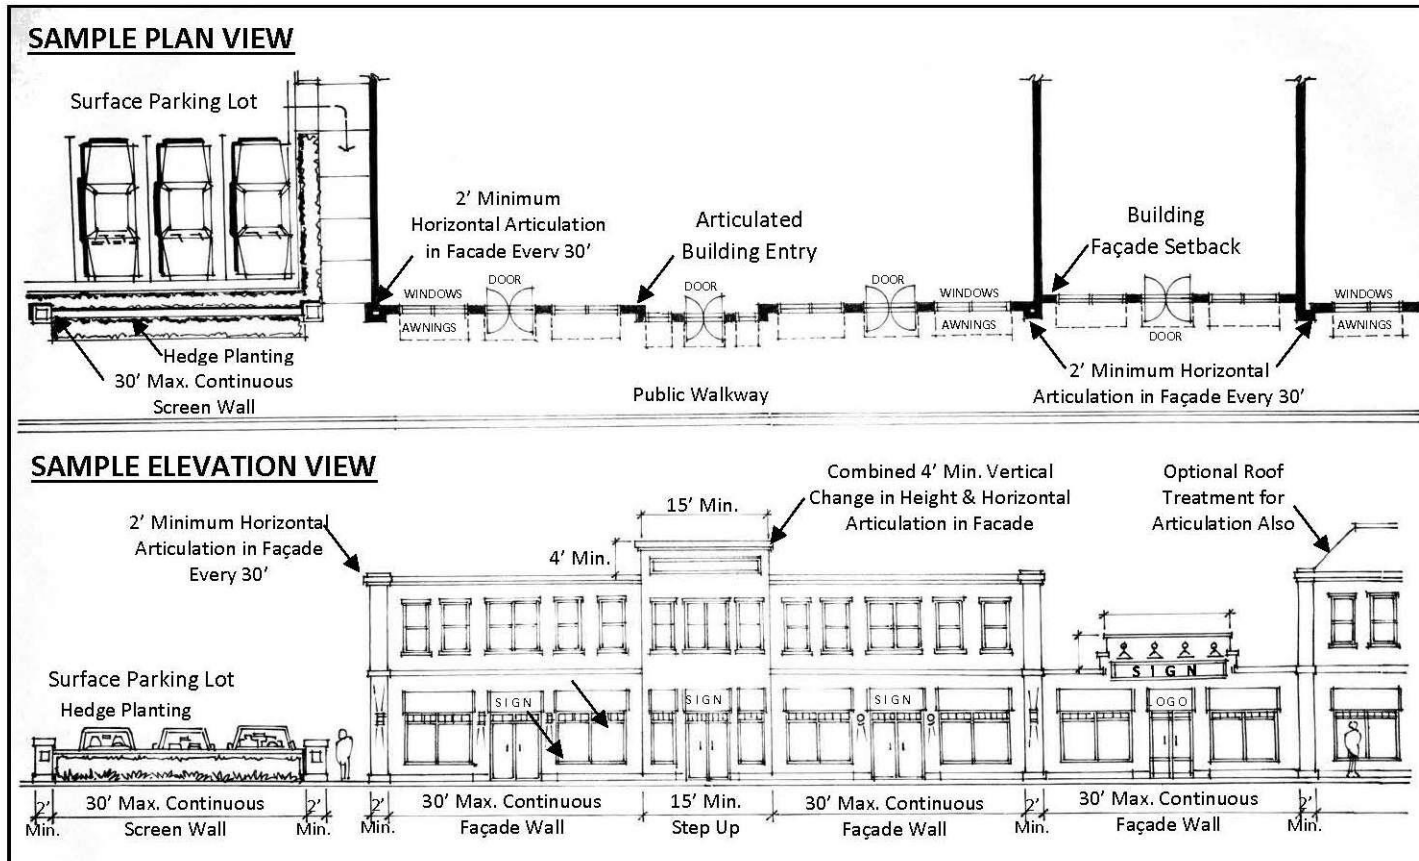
Vertical and Horizontal Articulation of Building Facades
